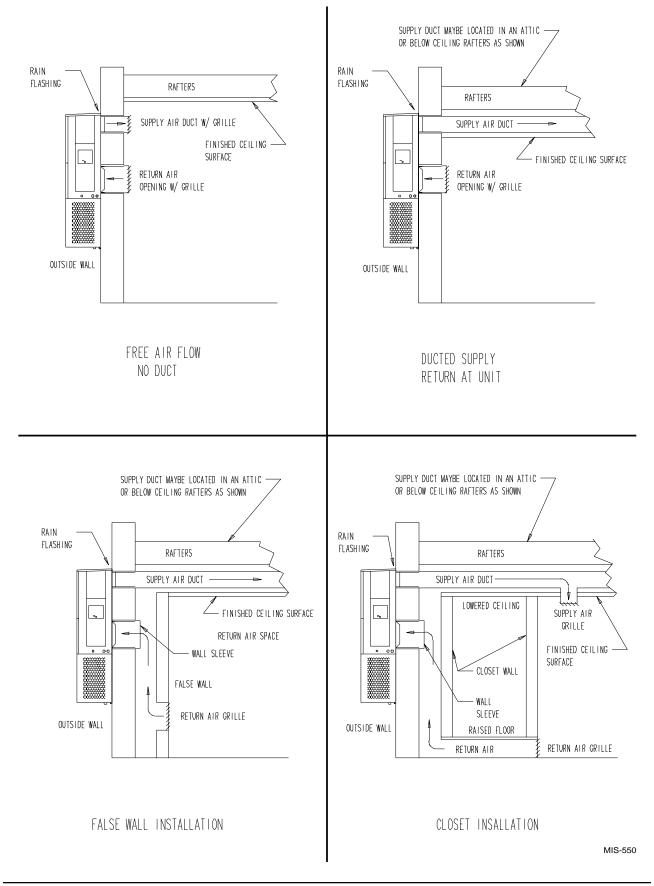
WALL-MOUNTING INSTRUCTIONS
